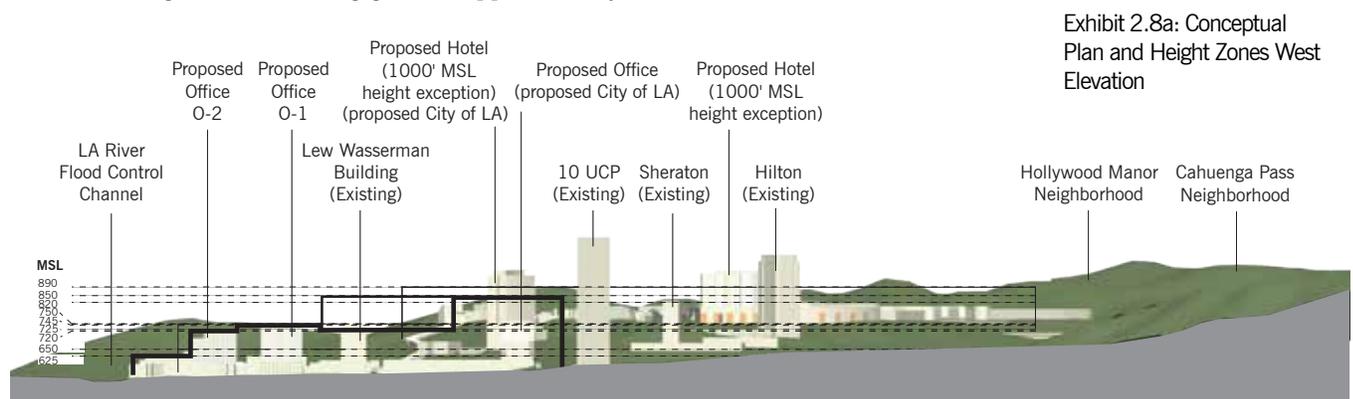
Conceptual Plan and Height Zones West Elevation
